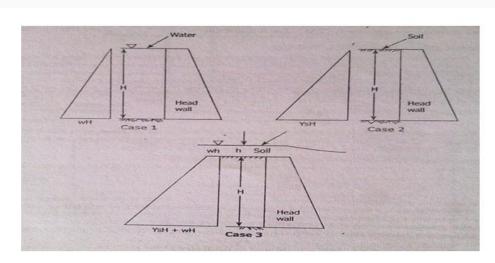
Load on the head wall of a drop structure. (Source: Murthy, 1985)
